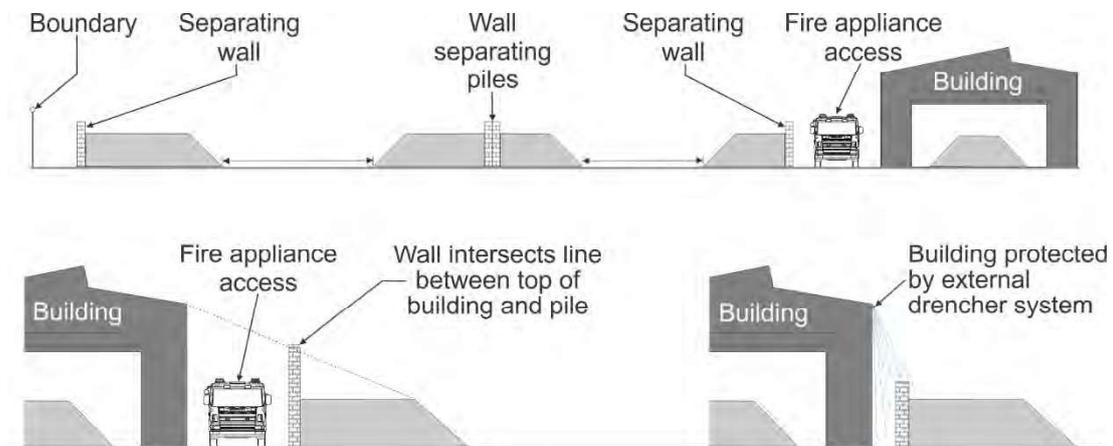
Examples of reduced separation using masonry wall or sprinkler system
